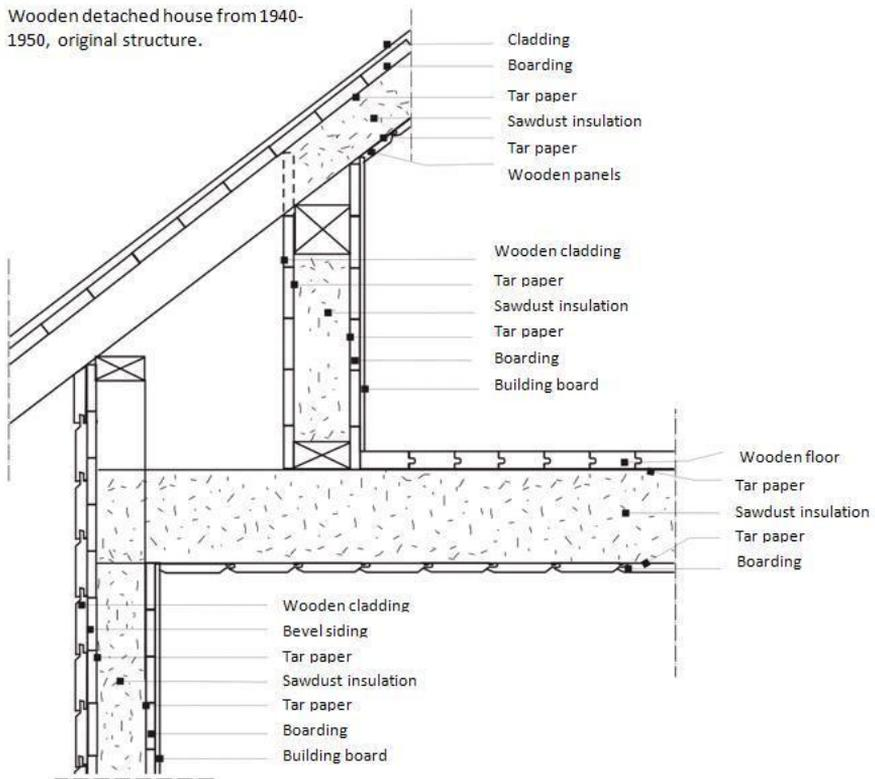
Roof and intermediate floors of detached wood houses of 1940's–1950's, original structures
